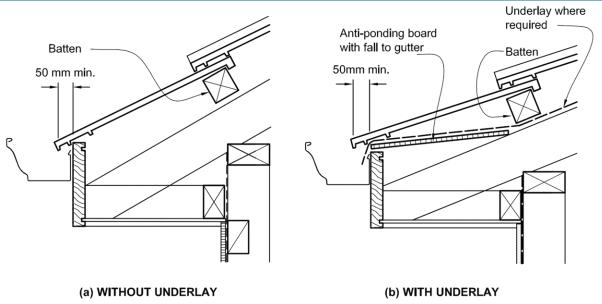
C: Timber fascia eaves for masonry tile
